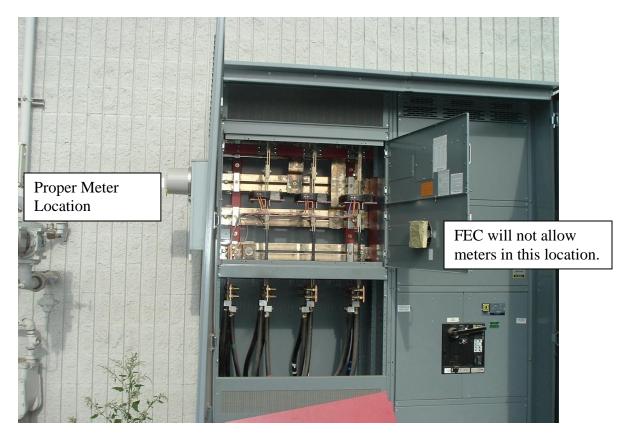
Pull Section and CT Section of Switchboard Cabinet
